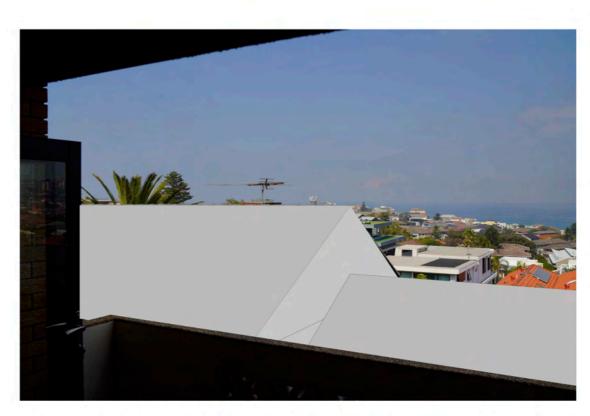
PHOTO WITH OVERLAY OF ADJOINING BUILDINGS AT No. 32 + No. 36 MILITARY RD FROM CG MODEL
